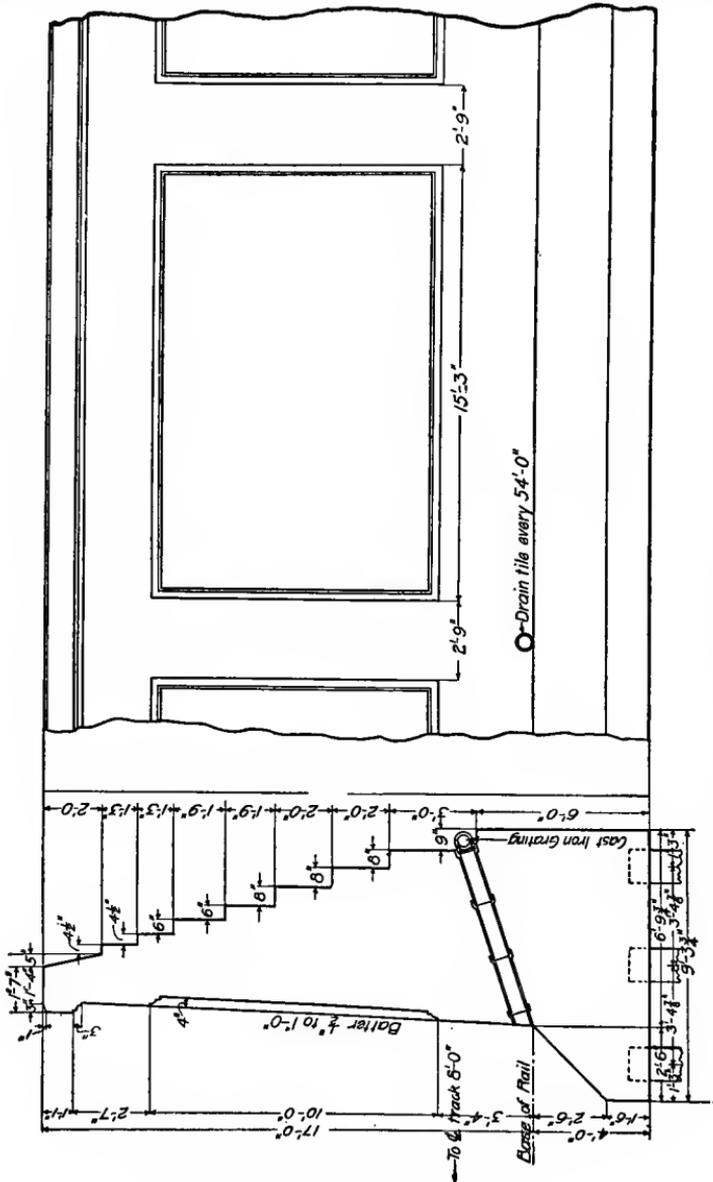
RETAINING WALL, ILLINOIS CENTRAL RAILROAD.
